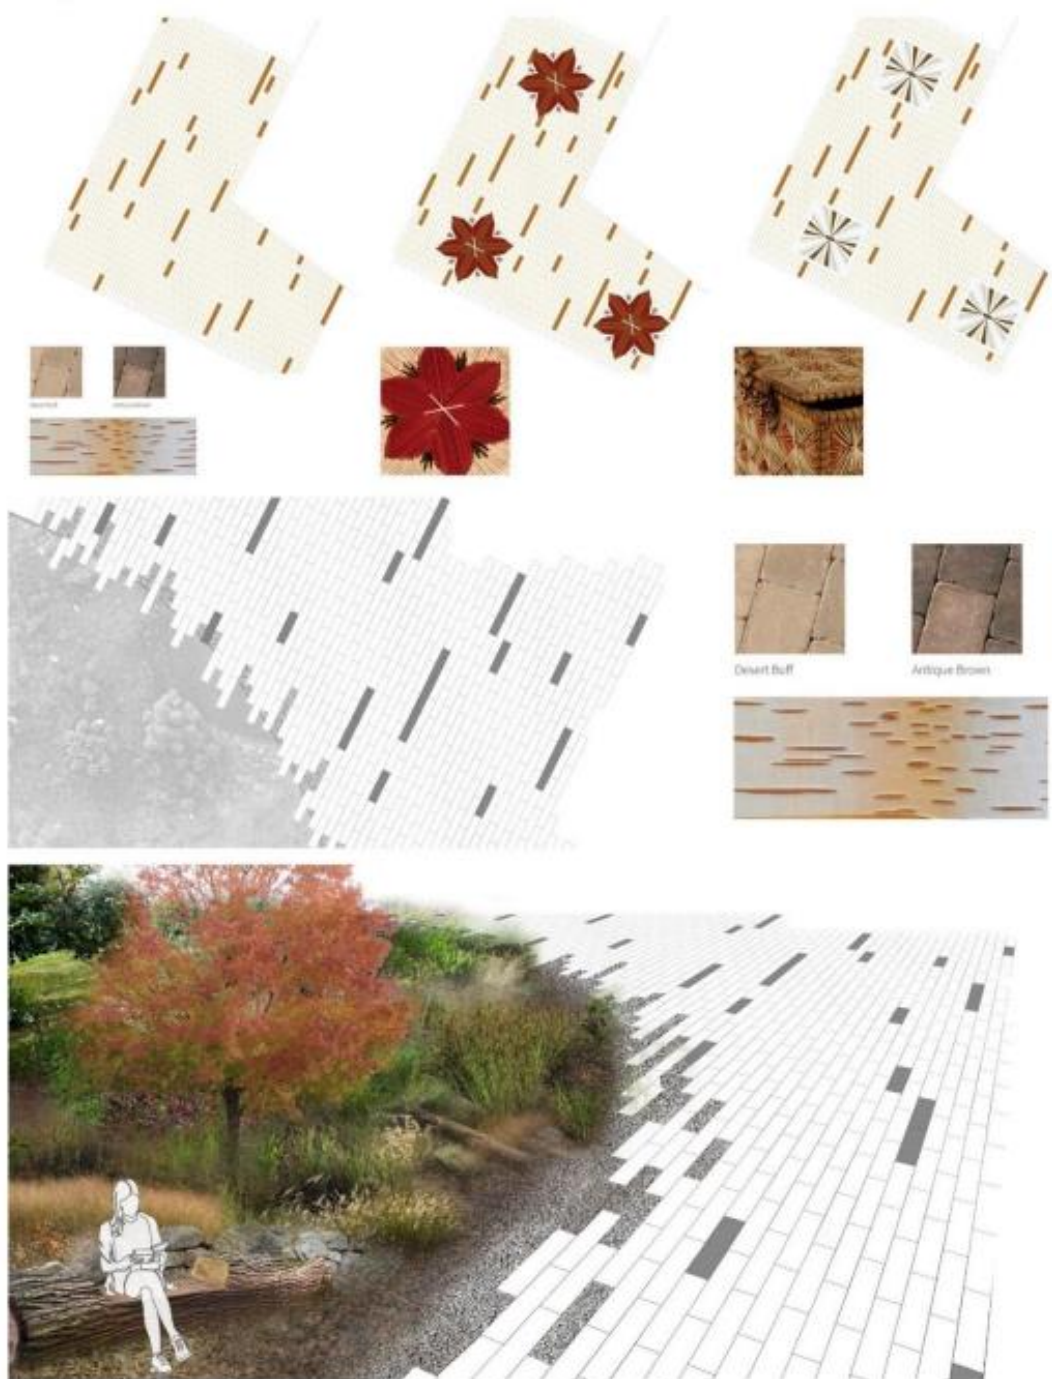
Plaza Birch Bark Paving Pattern:
